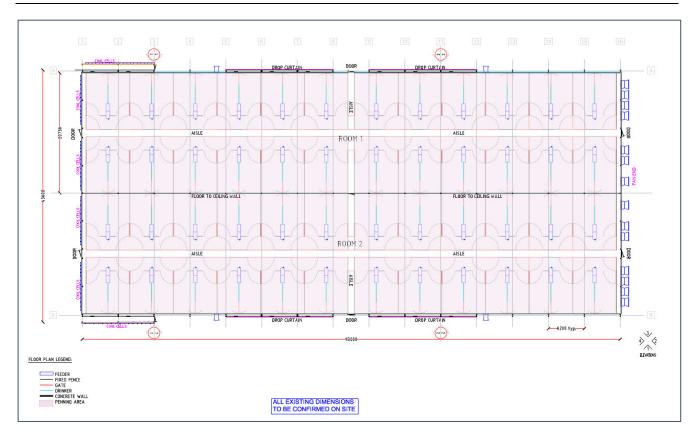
Typical Shed Floor Plan (Rivalea, 2025)
